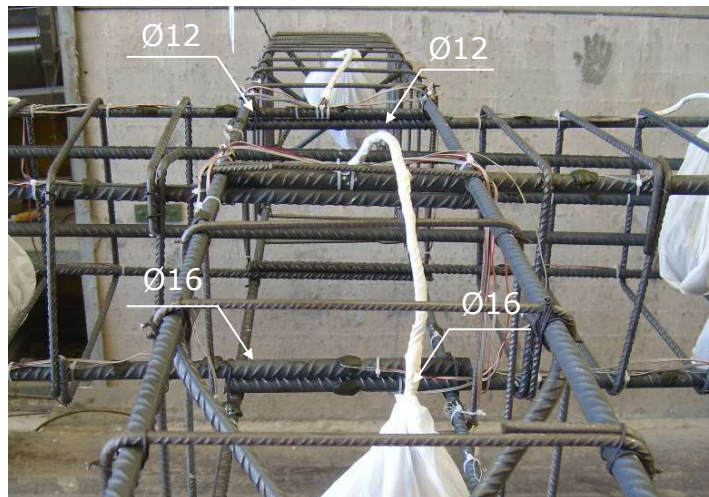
Arrangement of the overlapping reinforcements inside the joint.
